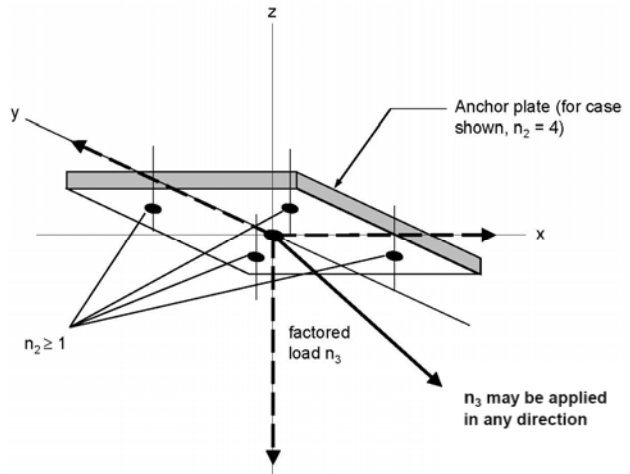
DETAIL A; ANCHORAGE POINT
